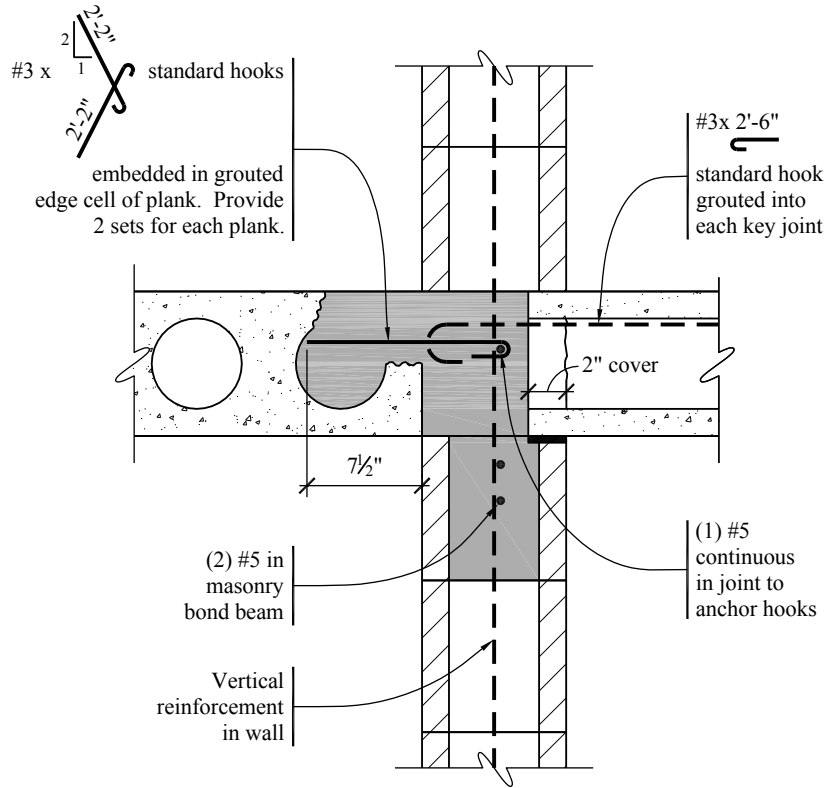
Joint 2 transverse wall joint reinforcement
